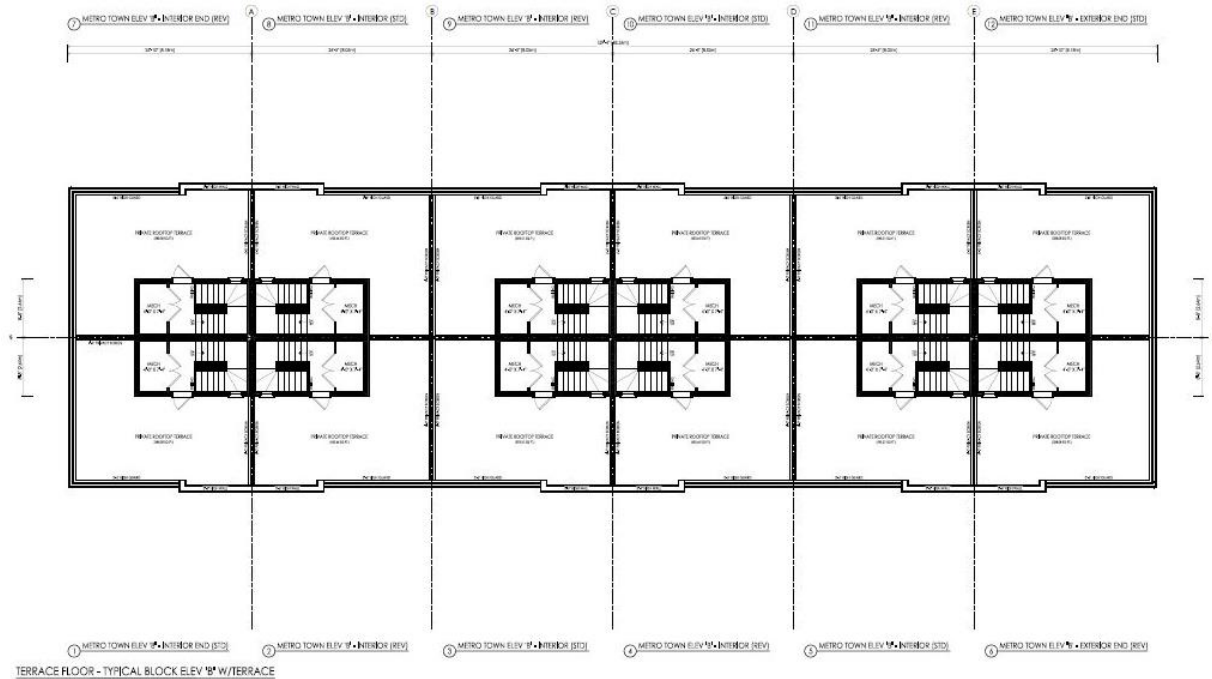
Metro Townhouse Elevations (stacked dwellings)
